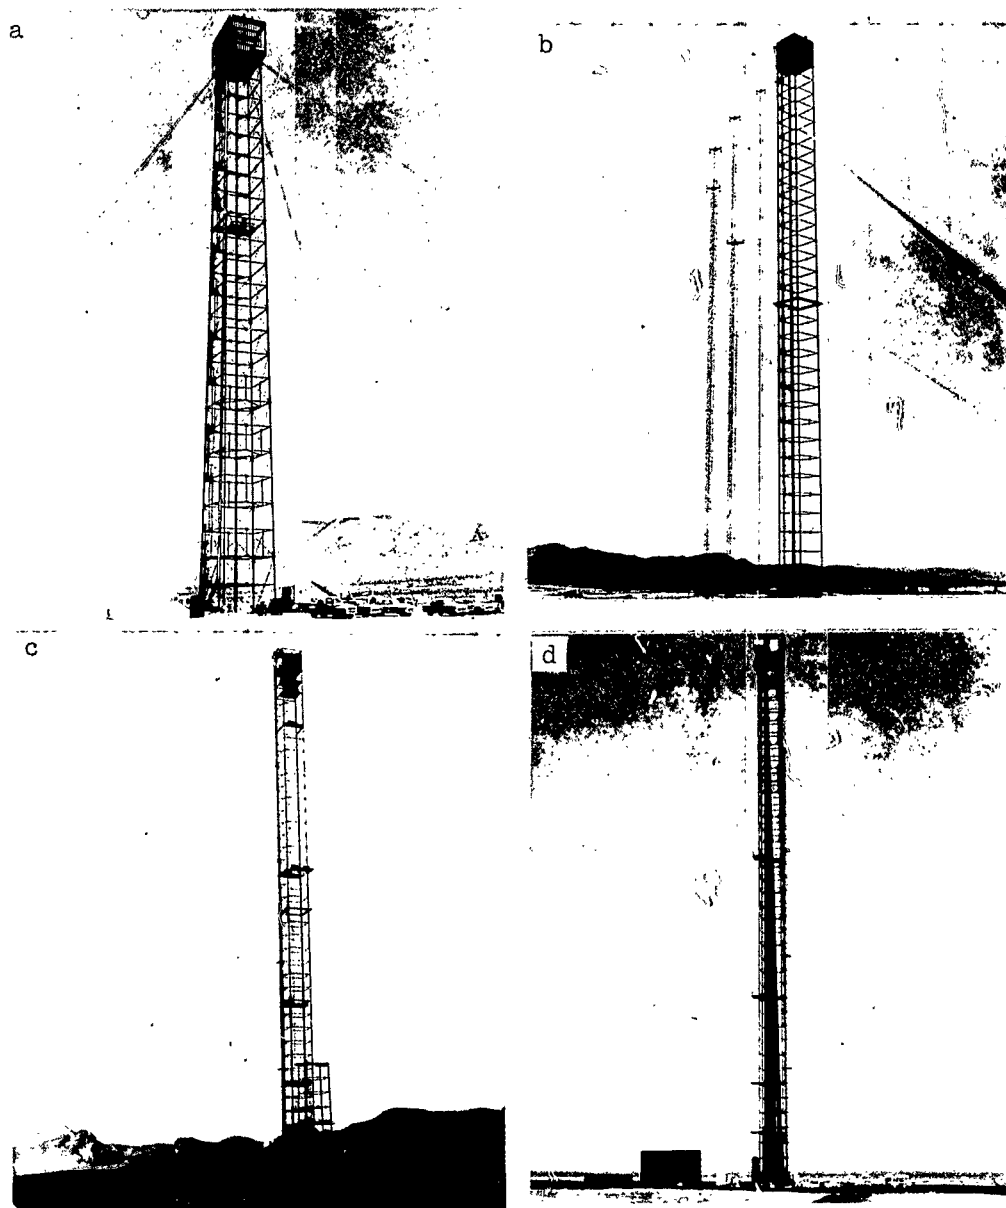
Pre-shot Views of Typical Towers. (a) 300-ft, 100-Ton Tower, Shot 11. (b) 400-ft. 100-Ton Tower, Shot 12. Note TV Towers. (c) 500-ft. 100-Ton Tower, Shot 8, (See Fig. C.3). (d) 500-ft, 100-Ton Tower, Shot 13. Note 7 large tubes in tower (See Fig. C.3).
